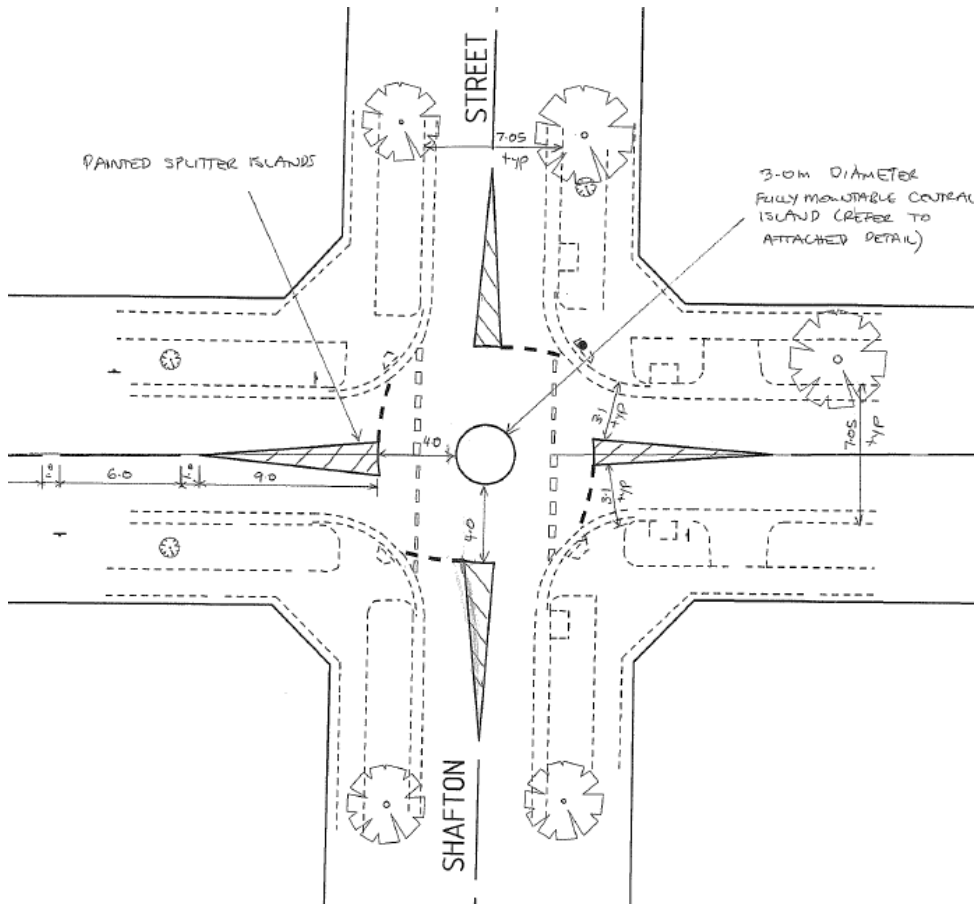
Plan drawing of mini-roundabout (Source: Tillotson 2015)
